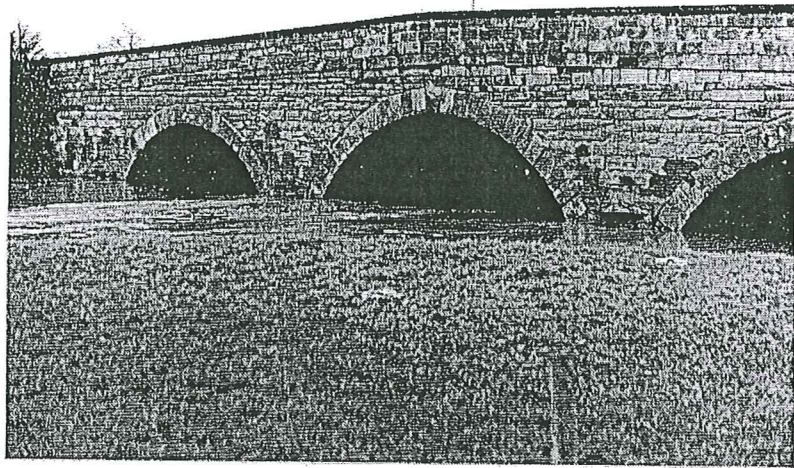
RYTON BRIDGE AND BUBBENHALL BRIDGE
